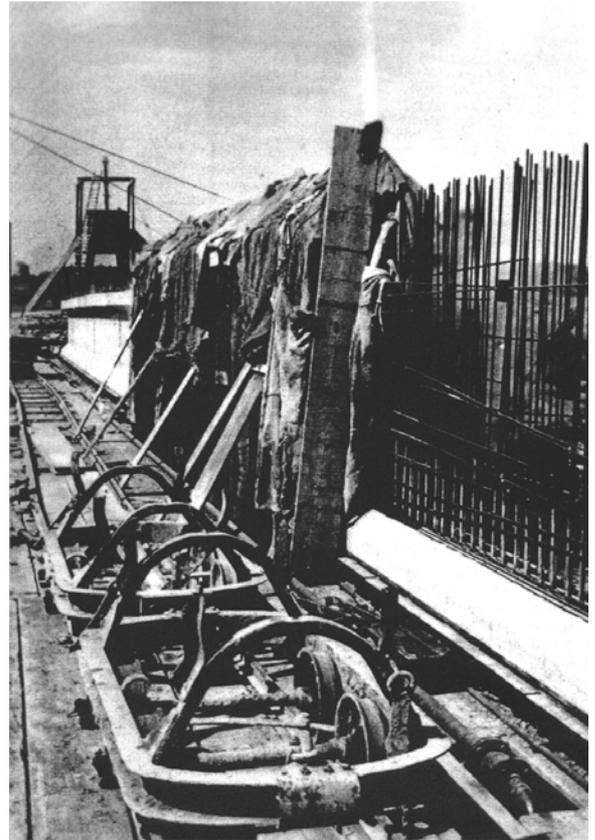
Fabrication of the pre-cast prestressed concrete girders for the Ölde Bridge. The rear section of the girder is complete; the central section is hooded for steam heating; and on the right, only the lower flange has been cast. (Grote and Marrey)
